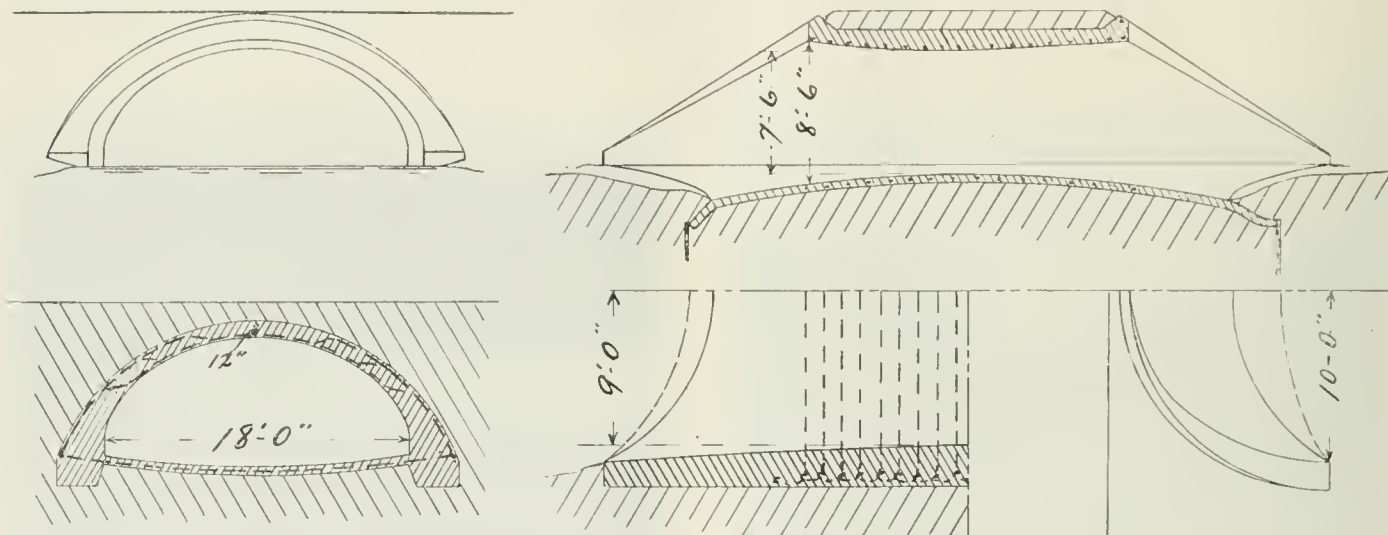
Elevation, Sections and Plan of Funnel-Shaped Horse-Shoe Arch.
